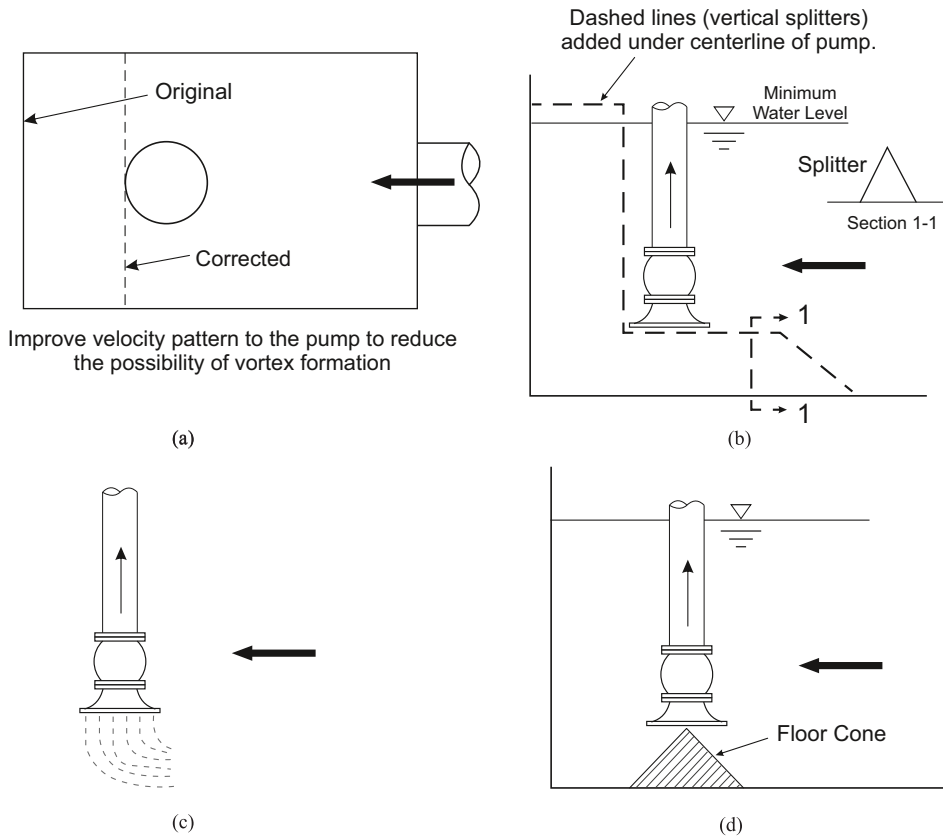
| Typical subsurface-vortex suppression devices: (a) increase clearance from backwall; (b) floor and wall splitters; (c) turning vanes fastened to pump bell; and (d) a floor cone. (Source: modified from Padmanabhan, 1987).
